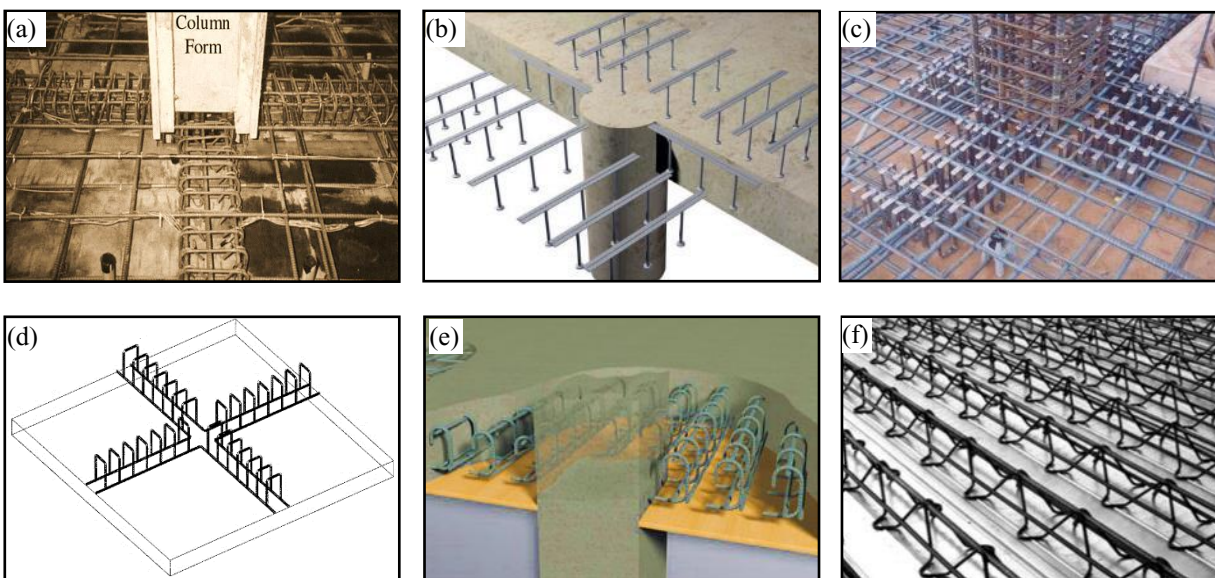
Shear reinforcement types: (a) Closed stirrups; (b) Shear studs; (c) Shear bands; (d) U-shaped stirrups; (e) Single leg stirrups; (f) Lattice reinforcement (Salama 2016)
